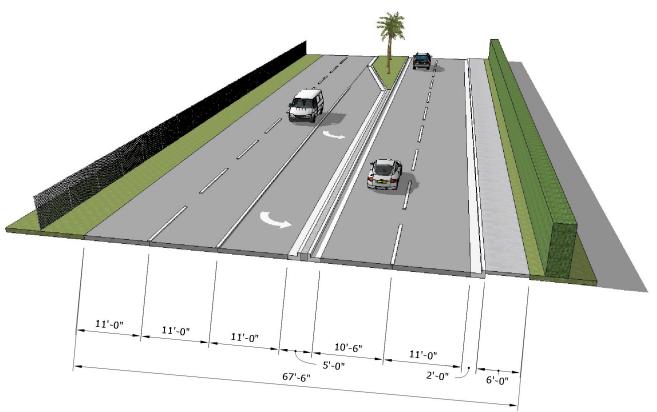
Illustration of the existing cross-section of NW 33rd Street west of Doral Central Park.
